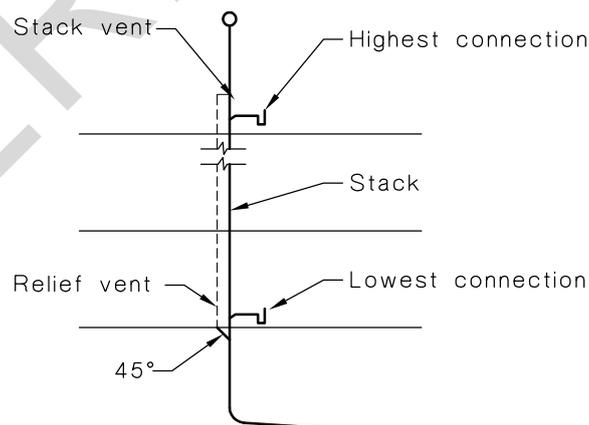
TYPICAL RELIEF VENT INSTALLATION
